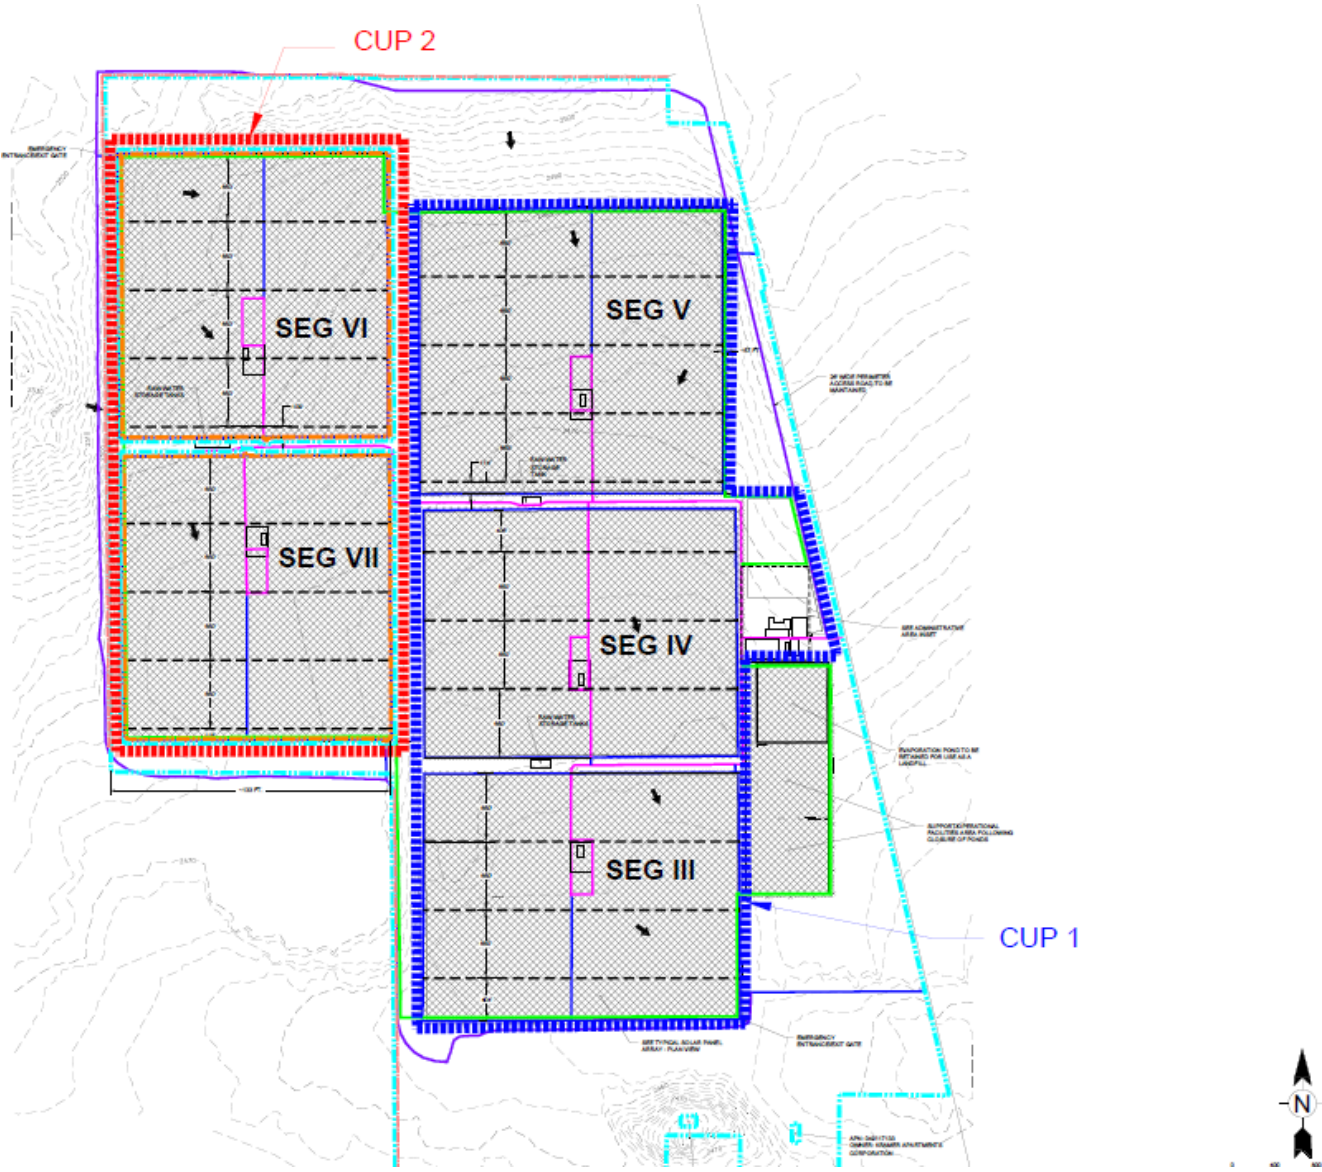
Site Plan Showing CUP 1 SEG S III – V and CUP 2 SEG S VI - VII
